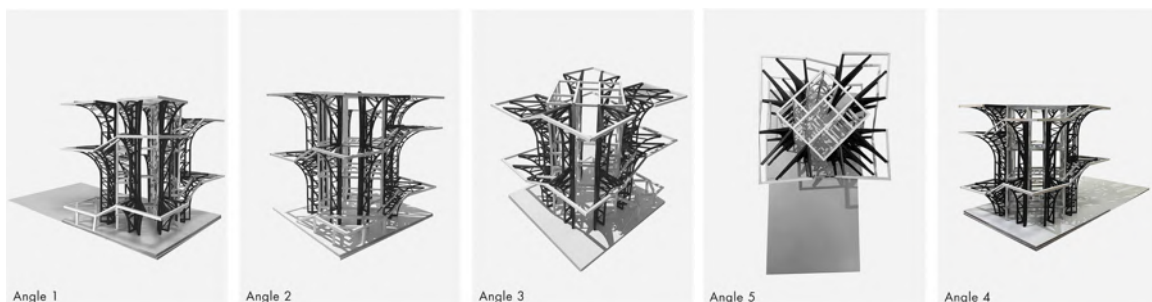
Proposal of a structure study as a 1/100 physical model (steel frame structure - brace type)
